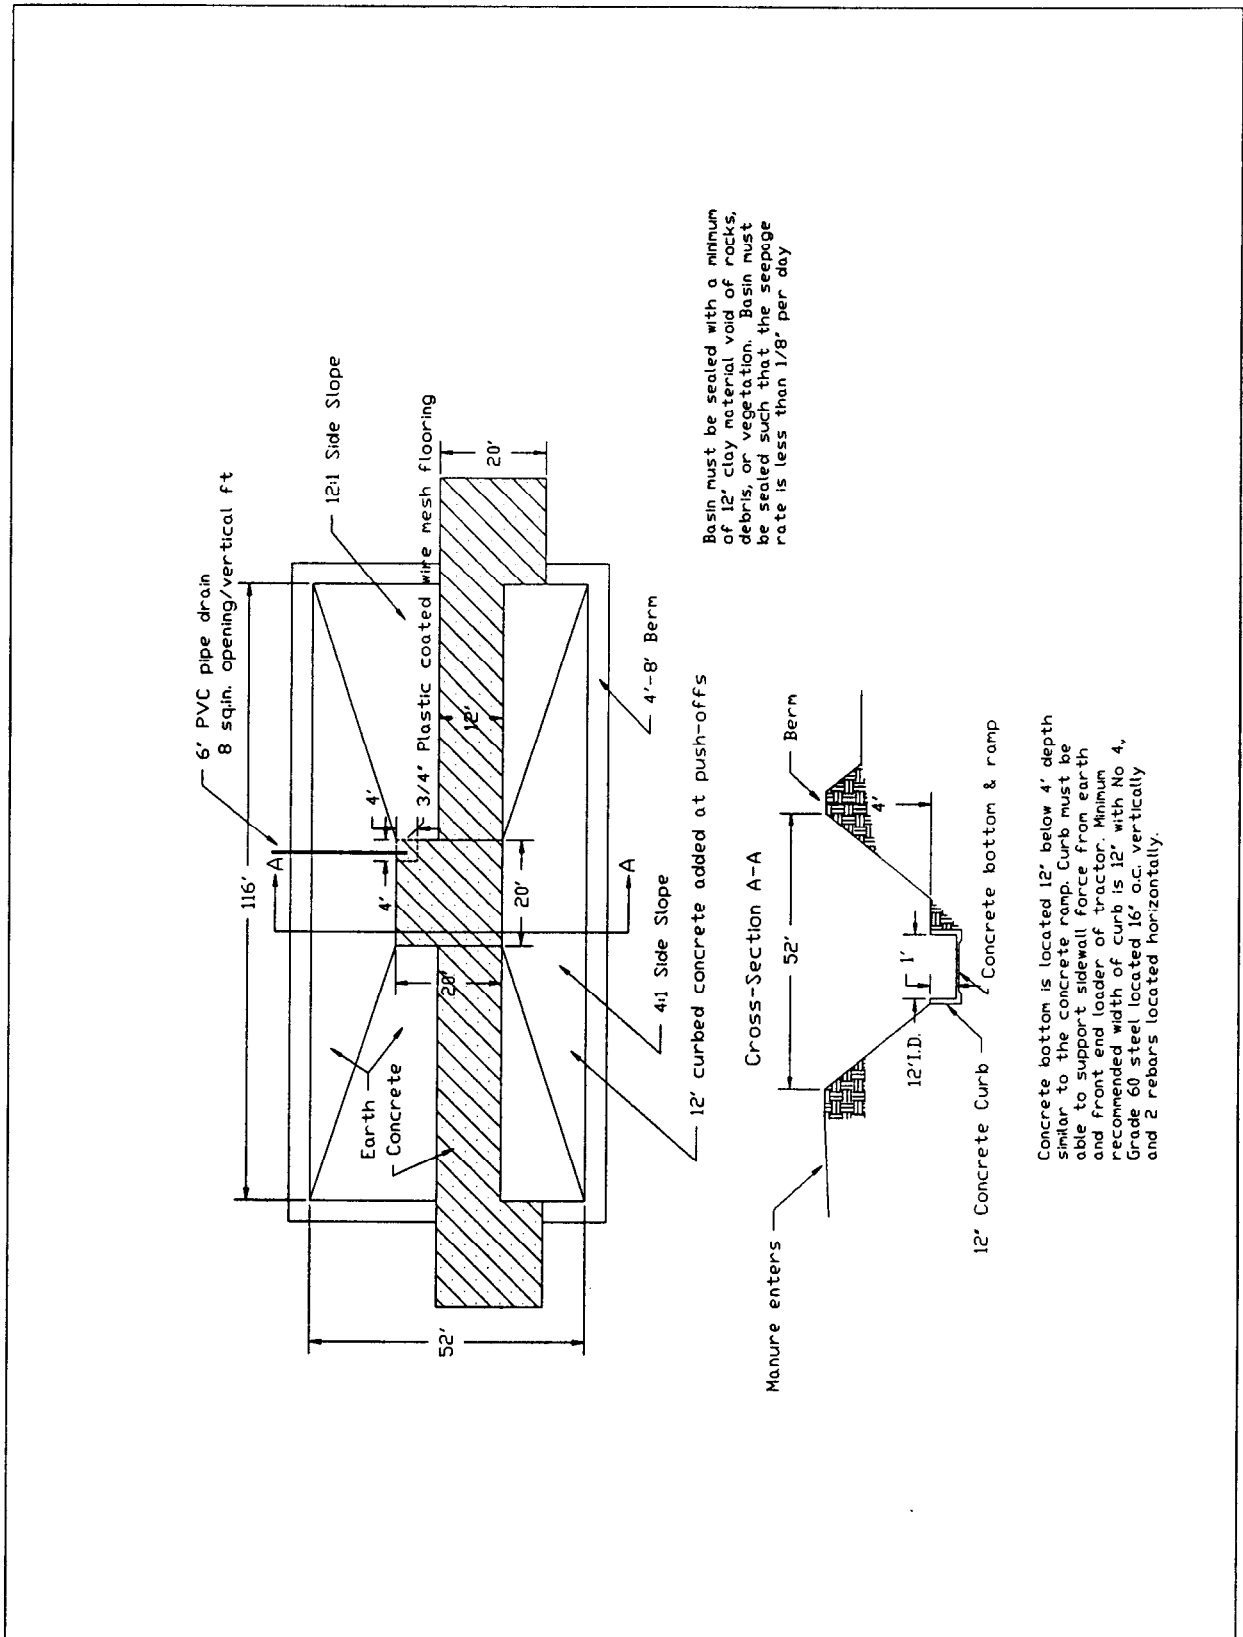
Concrete Bottom and Earthened Sidewalls with Concrete Entrance Ramps
